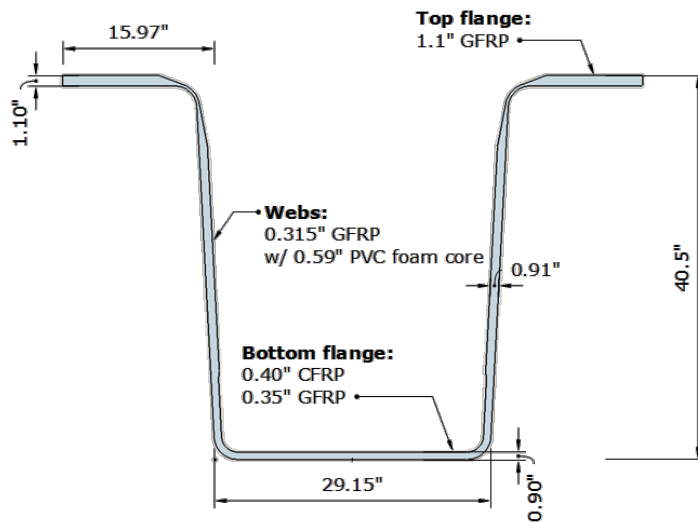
Single U-girder dimension for FRP girder bridge in Poland. [130]
